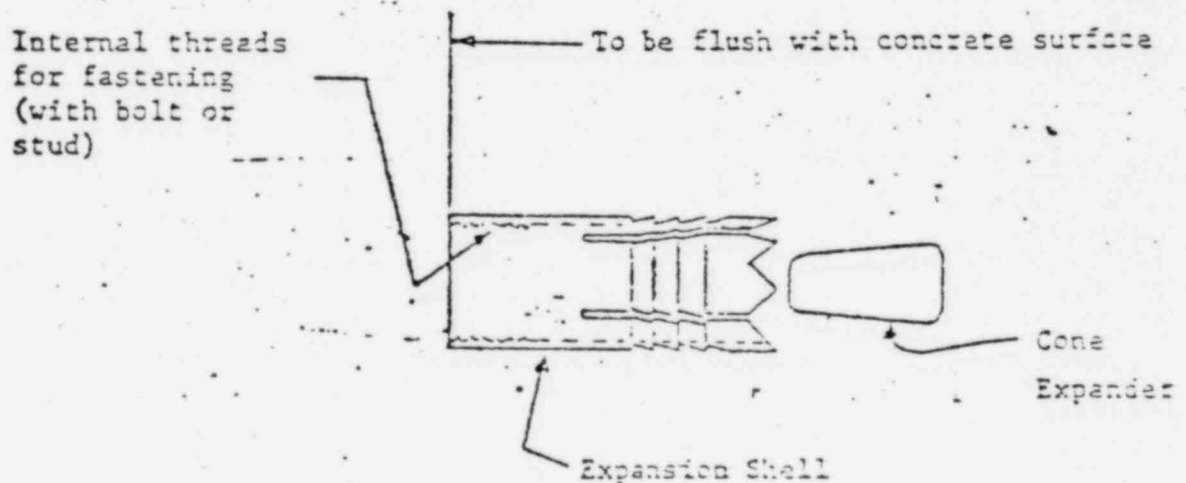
Typical Self-Drilling Type Expansion Anchor
